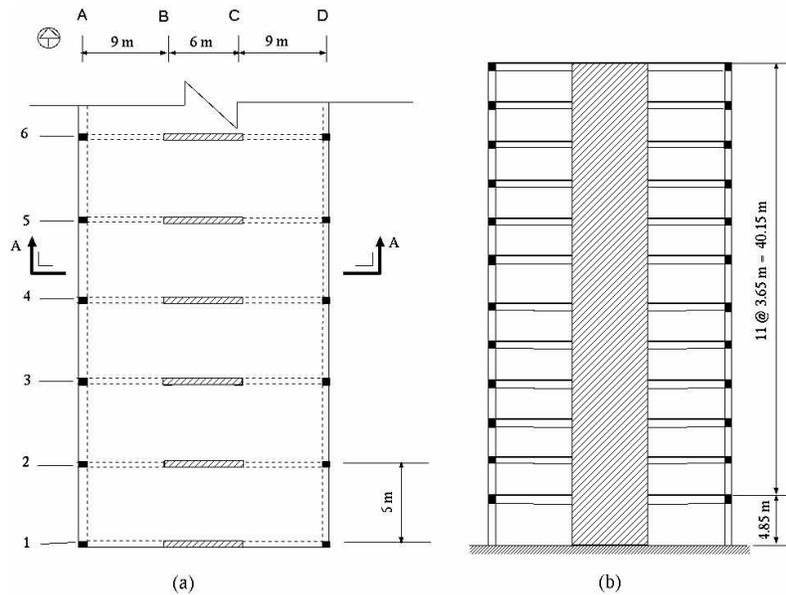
Layout of the building with shear wall (Vancouver), (a) plan, and (b) elevation
